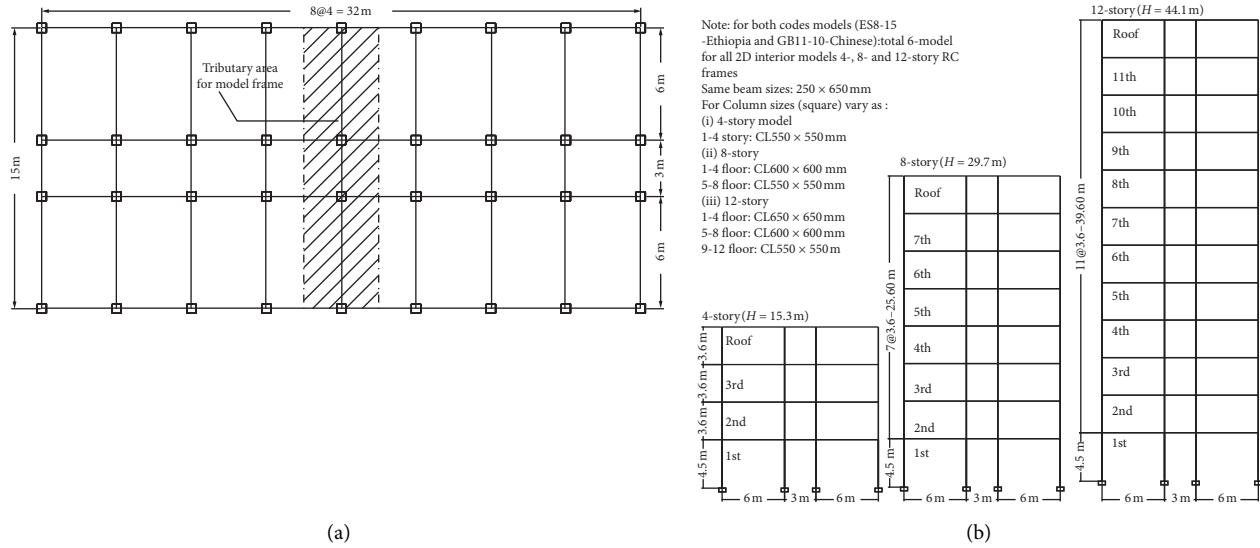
(a) Typical floor plan of A and B model building [27] and (b) 4-, 8-, and 12-story model frames of A and B.
